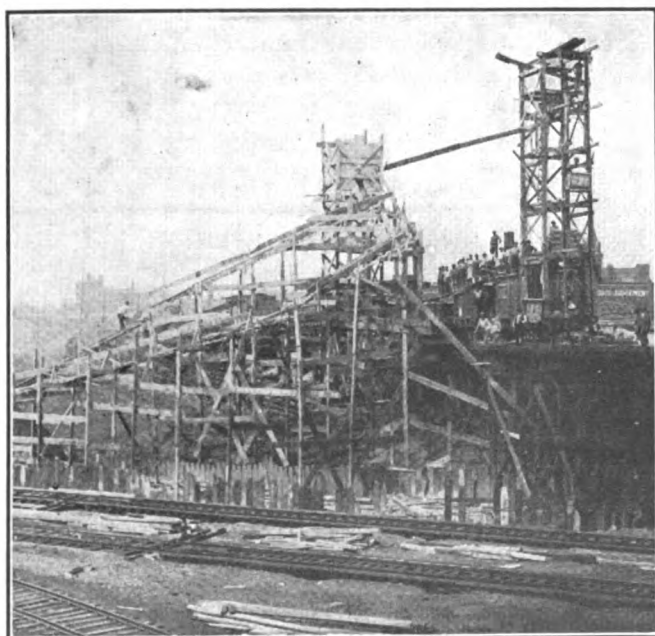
SPOUTING CONCRETE ACROSS MAIN-LINE RAILWAY TRACKS
